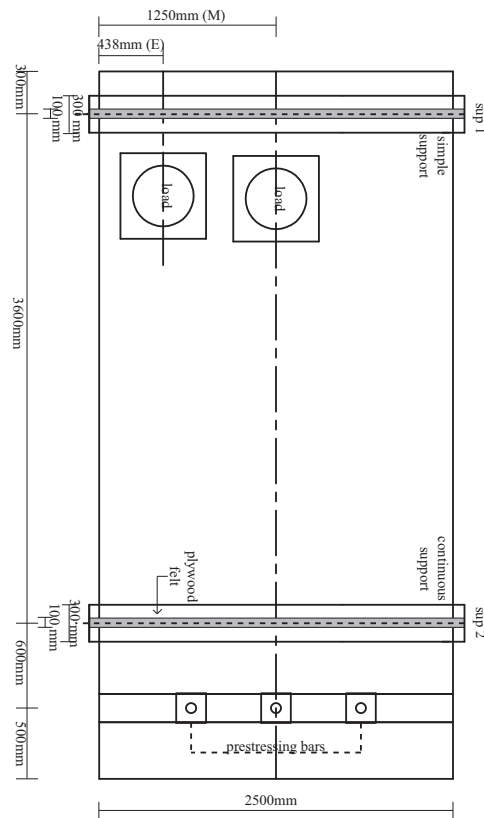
Top view of test setup for slabs under a concentrated load supported by a line support.
